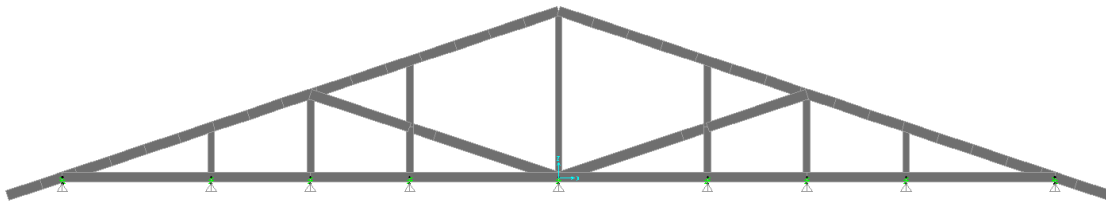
Gable end trusses of numerical model with additional external RTW connections
